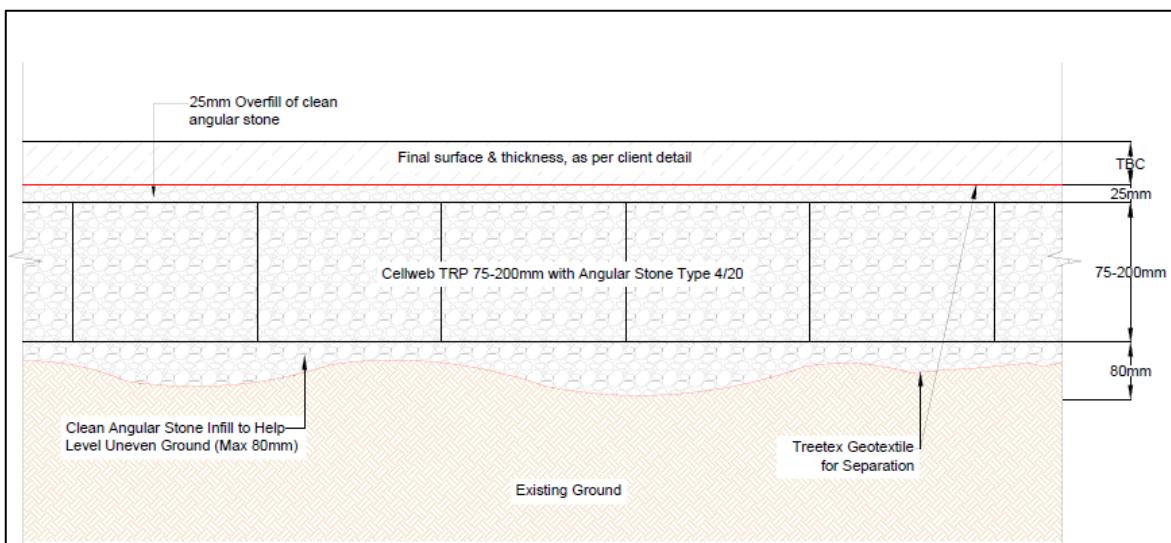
Indicative Cross-Section of Uneven Surface Filled With Clean Angular Stone: Cellweb
